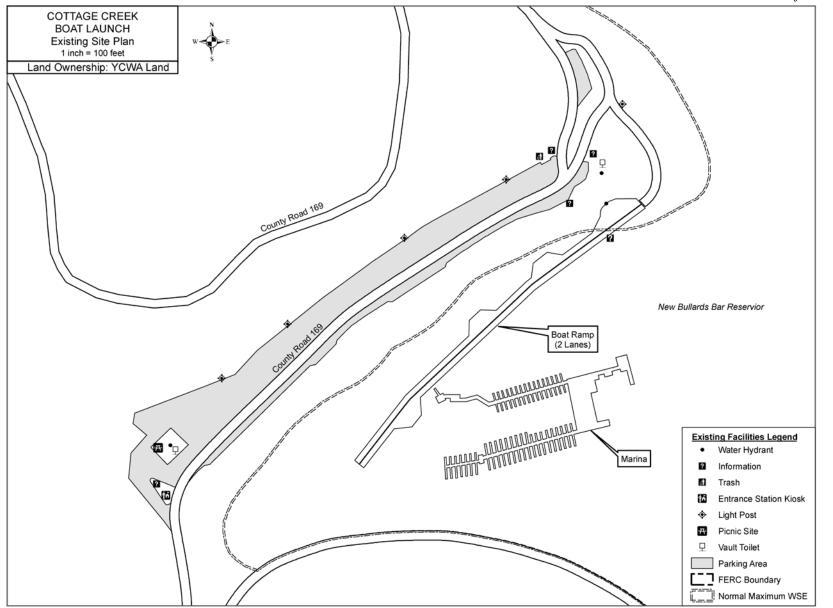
Existing site plan with proposed improvements for Cottage Creek Boat Launch and Marina facilities.
